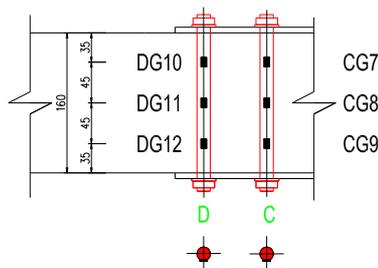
e Deviator Bolts C & D strain gauge Measuring-point arrangements
